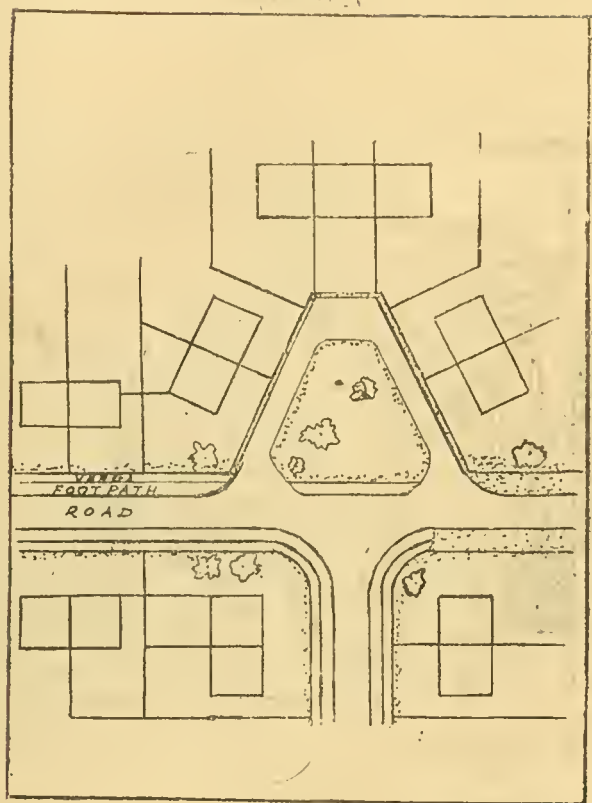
AN ATTRACTIVE LAYOUT WITH A SHORT DETOUR OF BUILDING PLOTS AND "BUILDING LINES."
